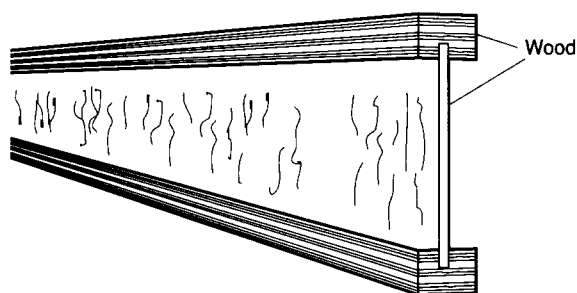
(a)(ii) Typical composite wood joist construction.
